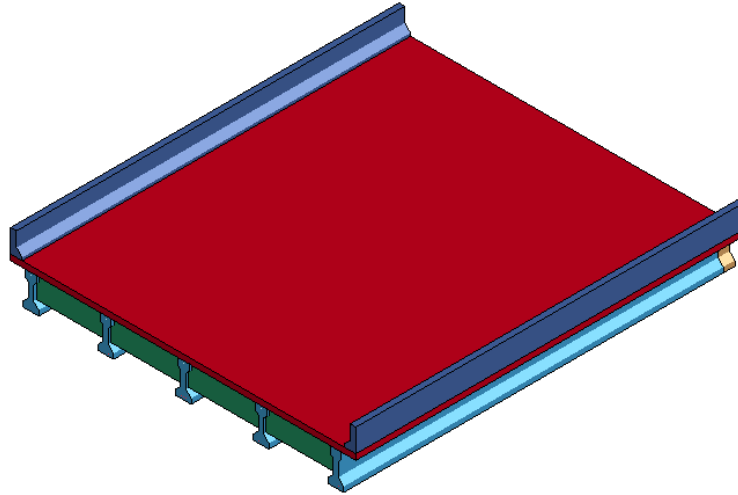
3-D View of Archetype 2 Bridge Model.
